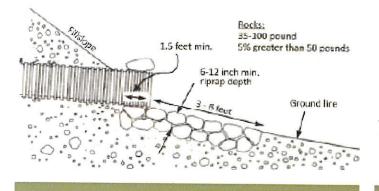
A. Riprap armor at culvert outlet (Modified from: Kellar et al., 2011).
